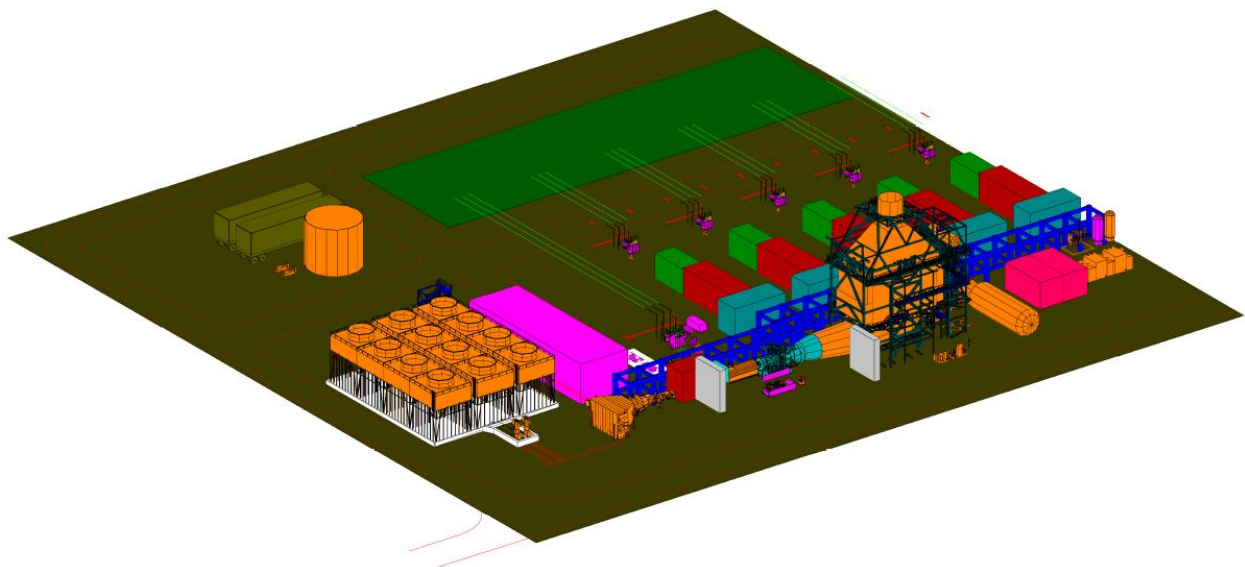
Conceptual TC-RHT GTCC Plant Layout – Isometric View
